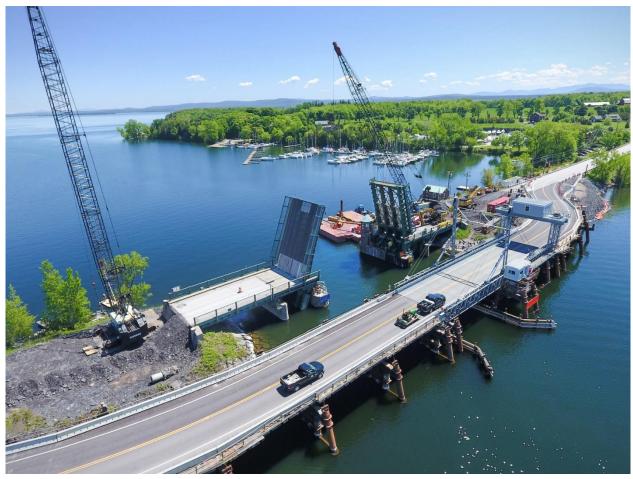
Demolition Of Existing Bridge Proceeding After The Temporary Bridge Was Completed
